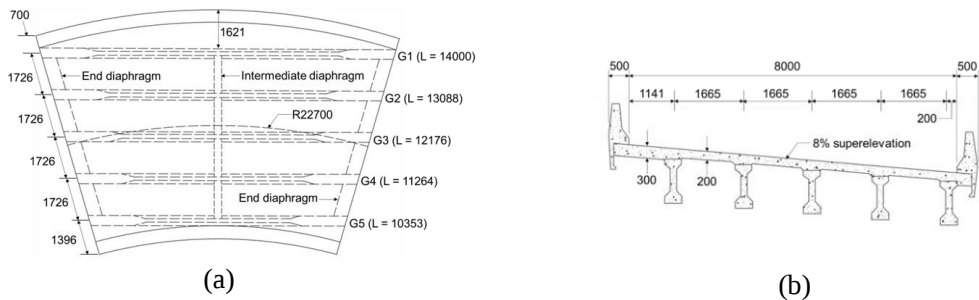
Geometry of bridge superstructure: (a) plan and (b) typical cross-section (Unit: mm)
